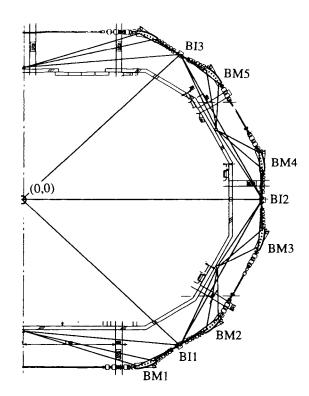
Layout of alignment datum survey(half ring).
